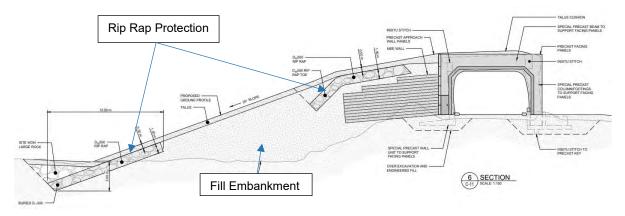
Fill Embankment on the Southern Flank of the Protection Structure
